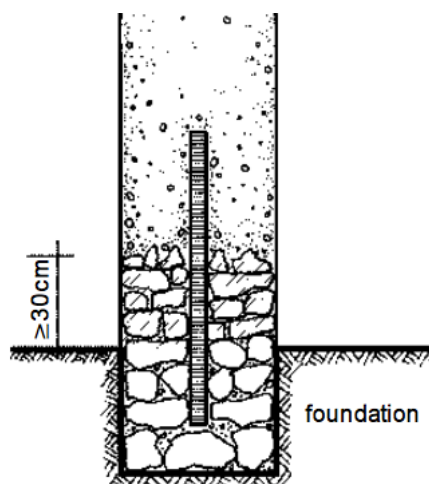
Joint between foundation, rammed earth wall and plith, by Gernot Minke
